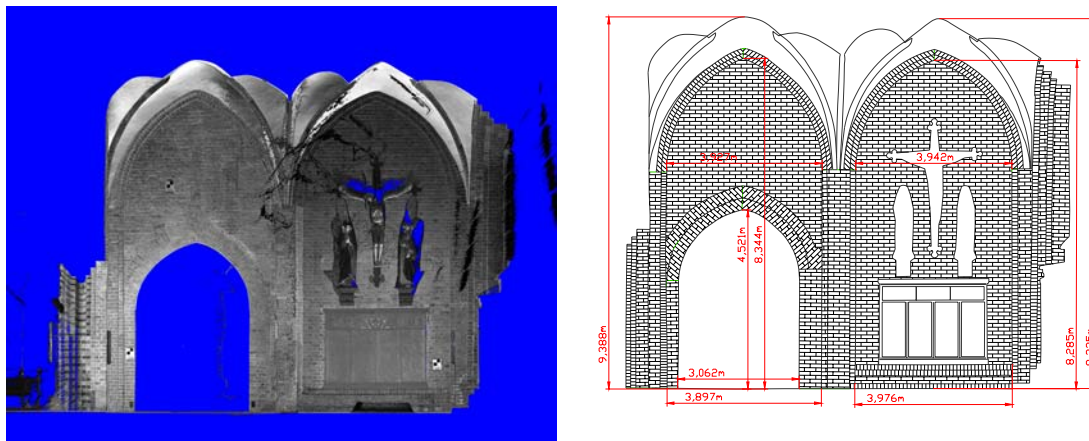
Orthophoto and AutoCad Plan of Meldorf
